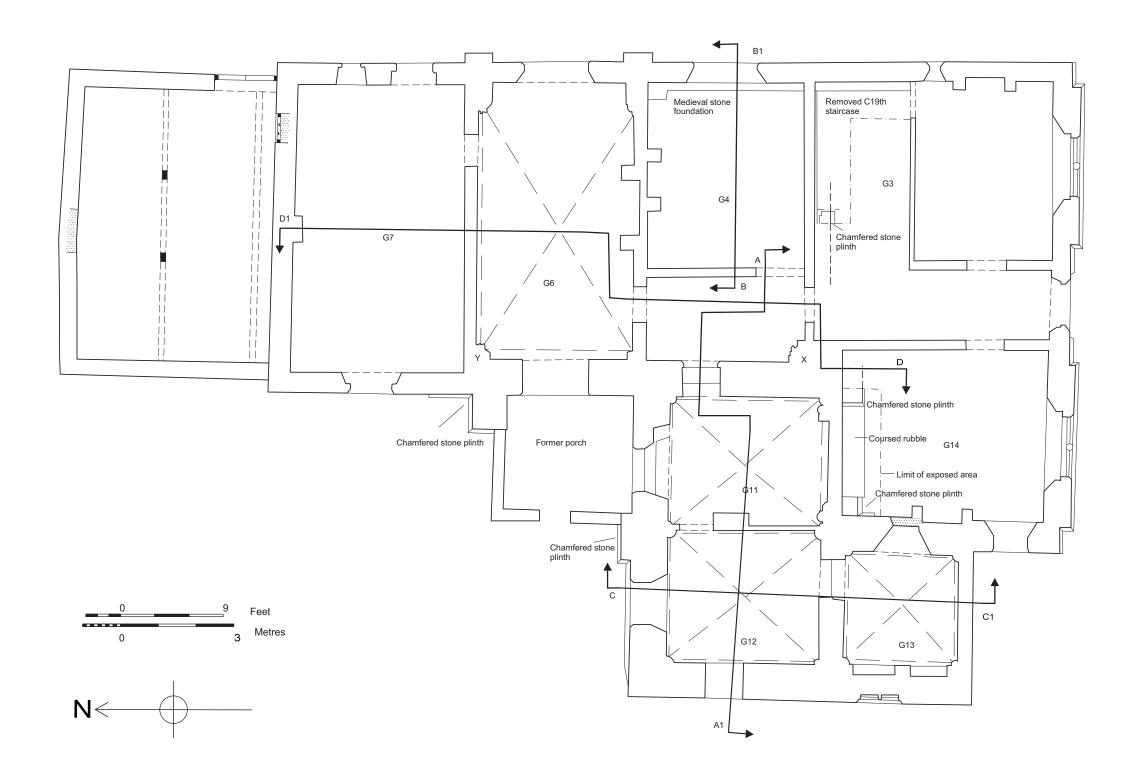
Farmhouse Building, Interpretive Ground Floor Plan, with section drawings located. Print Scale 1:100
